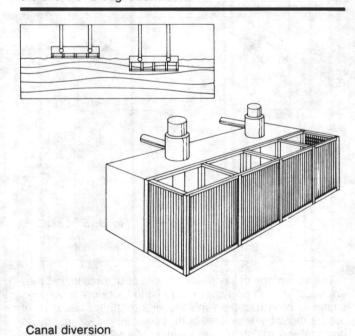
River and canal intake facilities (single-level intakes) (Permission of Johnson Division, UOP Inc.)
